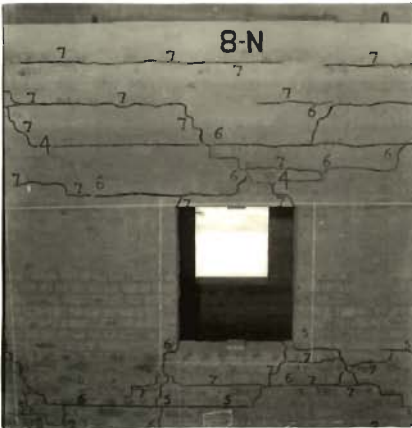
\_ TOP SPANDREL OF NORTH WALL HEAVILY DAMAGED DURING SHOCK NO.7 ( MODEL 8 )
